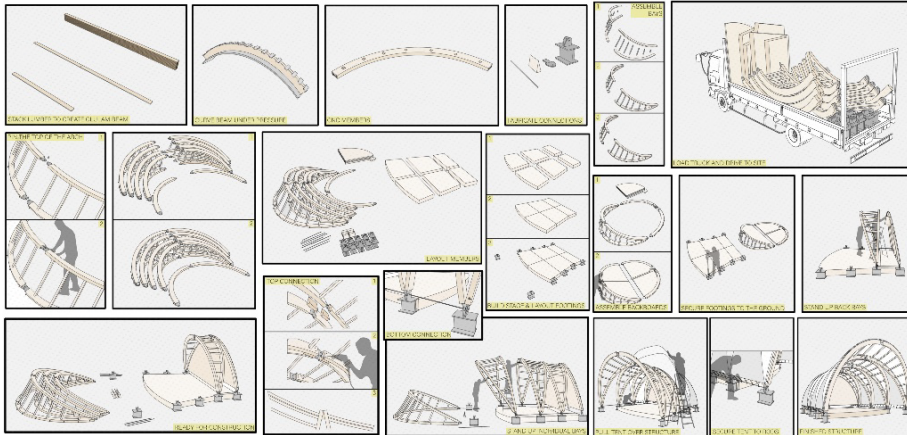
Storyboard shows processes of pre-fabrication and on-site construction
